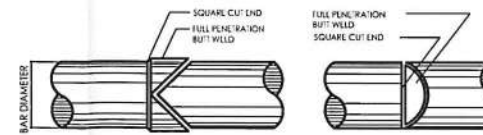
TYPICAL WELD SPLICE DETAIL
